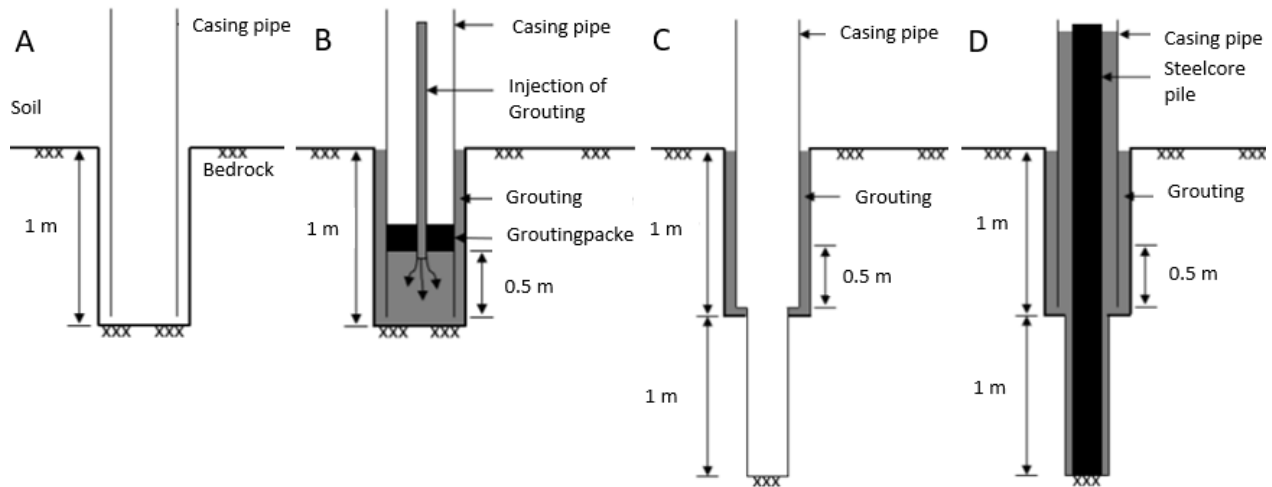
Clockwise from top left; Drilling of casing into bedrock (A), grouting/bentonite injection (B), drilling into the cast and bedrock (C), steel core installation and grouting (D). Modified from [Aune & Østvang, 2020]
